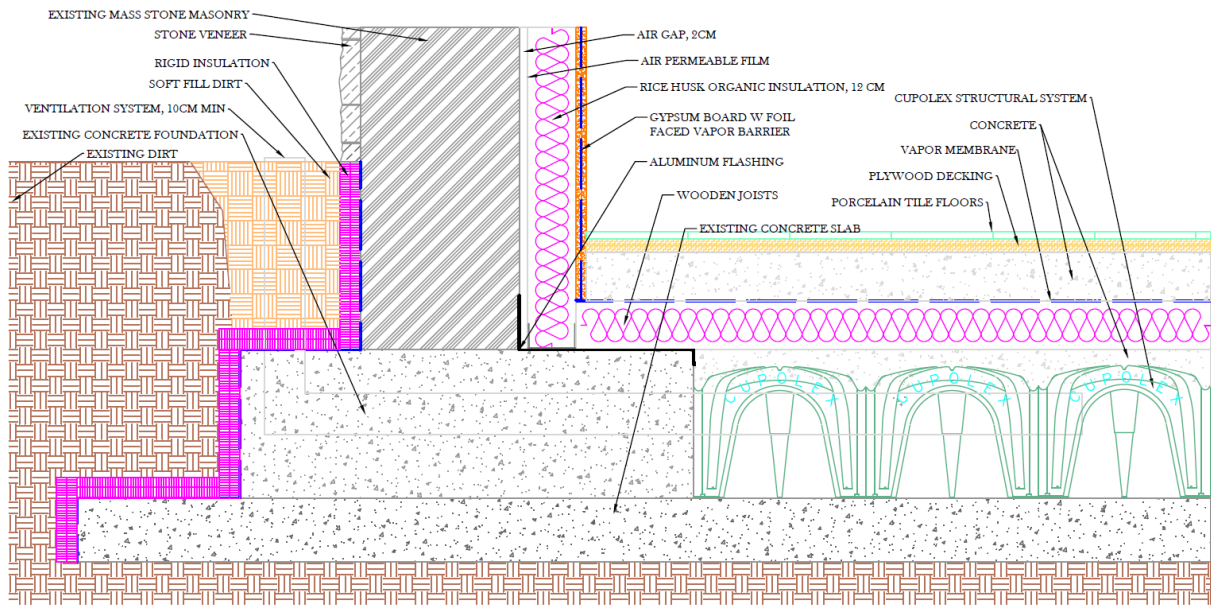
Building 12 Schematic Drawing 5-Wall to Foundation Section
